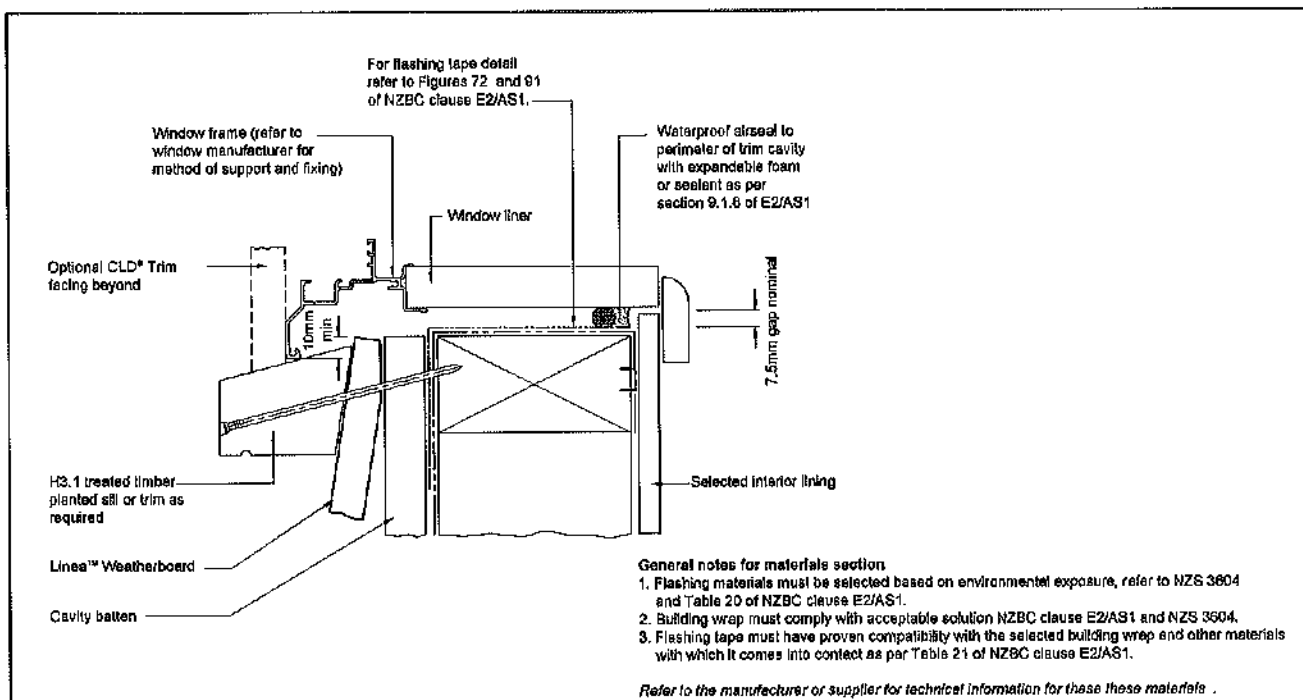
CAVITY WINDOW SILL WITH FACINGS
